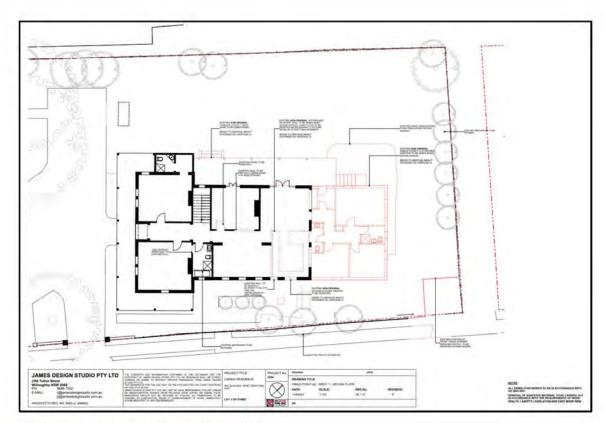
Demolition Plan - Sheet 1 - Ground Floor
